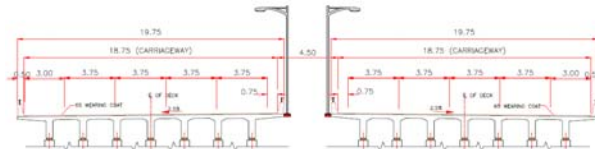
shows the typical cross section of the main road, ramps and bridges on the main road. It is noted that the ultimate stage of EPE is proposed as the dual 4-lane highway. In the first stage, the main road is scheduled to be constructed as the dual 3-lane highway, while the bridges on the main road will be constructed as the dual 4-lane structure.
